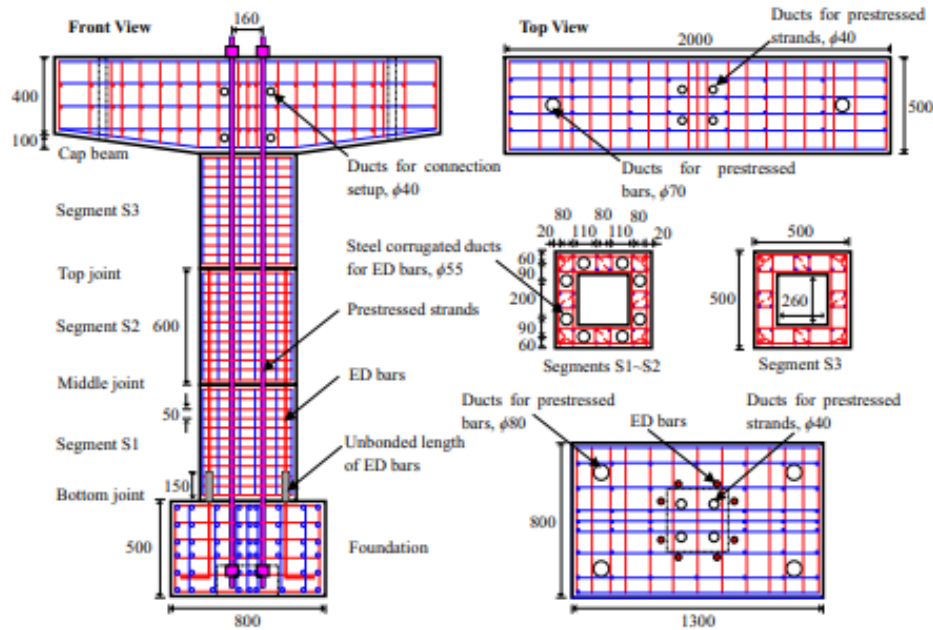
Segmental Column Detailing (Wang et al., 2018)
